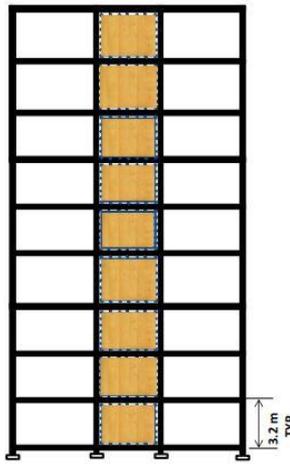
Elevation view of the 9 storey bare 2D fram
